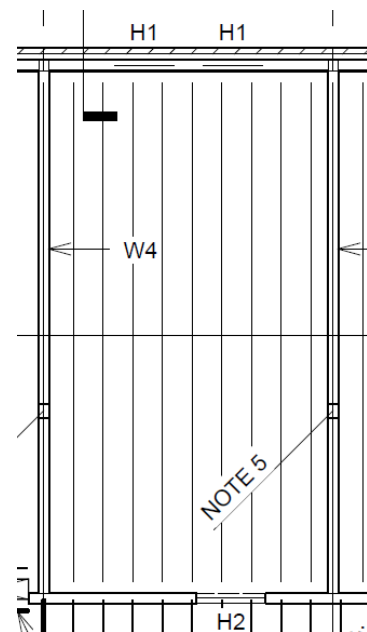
Typical wing bay of 26 feet deep by 14 feet wide (Plans S1.3A)
